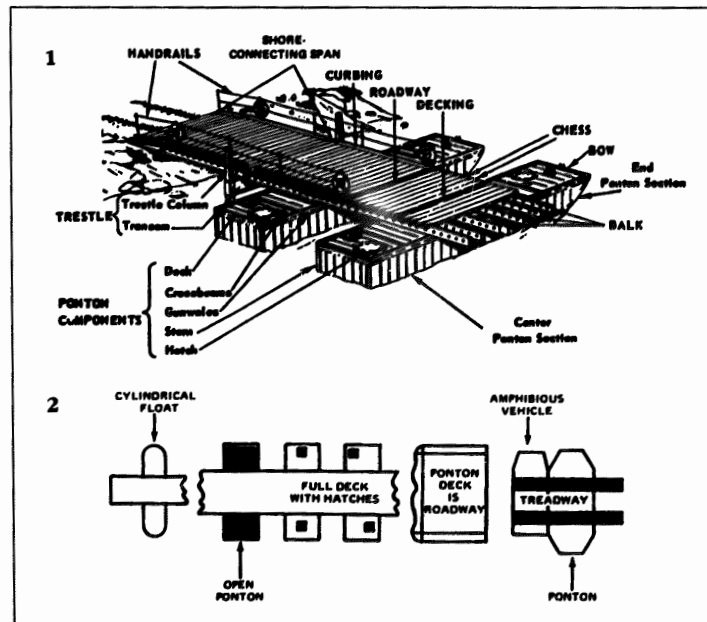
1) Components of a military style float bridge. 2) Common types of floats and bridge decks.
